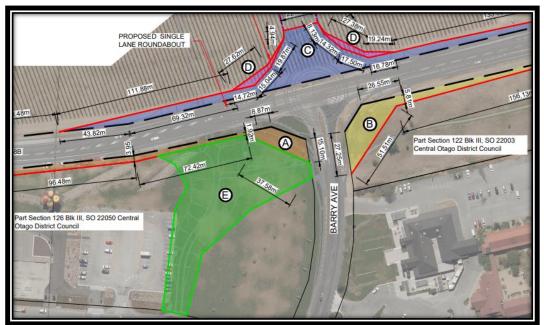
Revised (Preliminary) Plan of the 'Wooing Tree' Roundabout.
